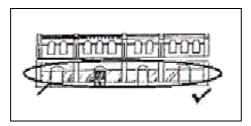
Shop front and openings are to be sympathetic with the overall proportions of the building and the division of the building into vertical bays.
